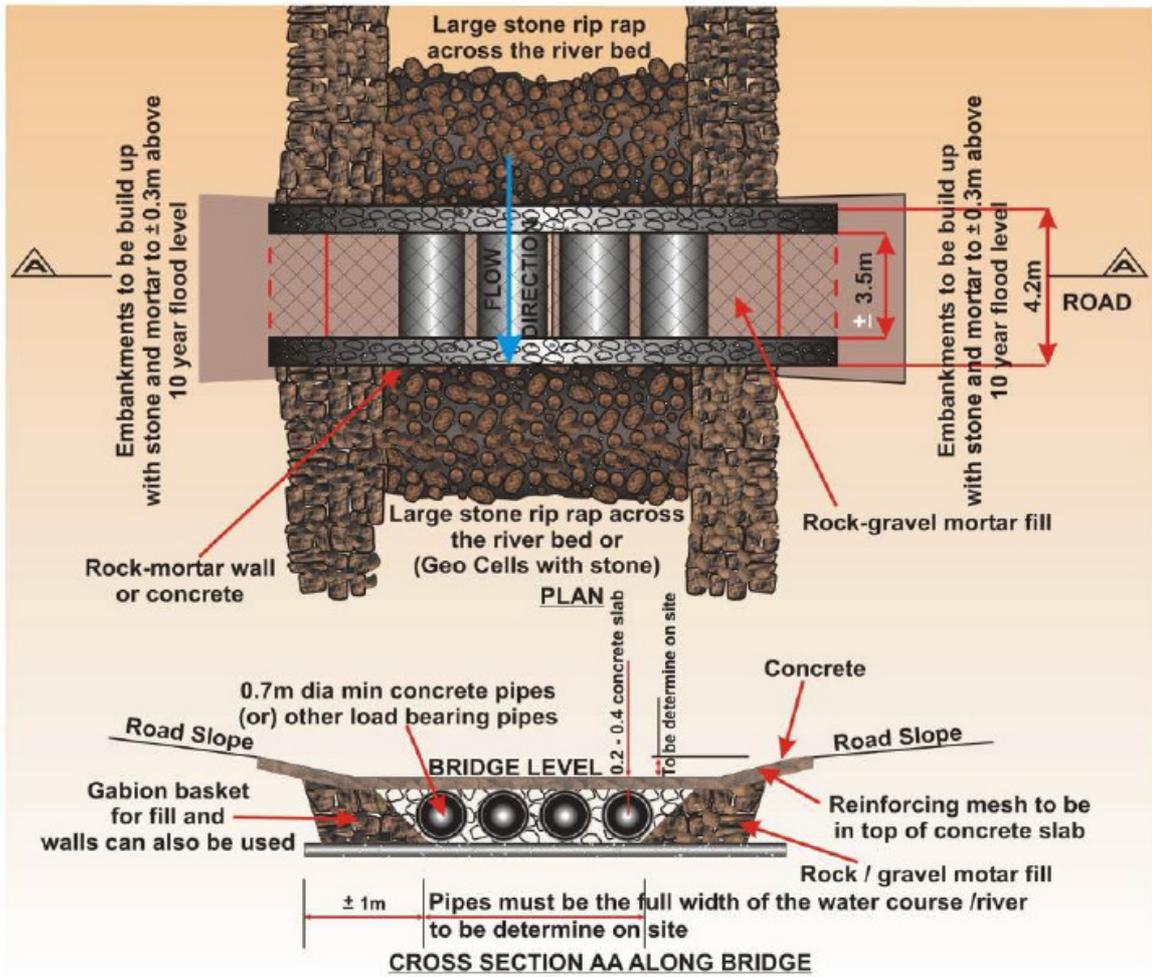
Pipes and gabions culvert crossing<sup>(1)</sup>
